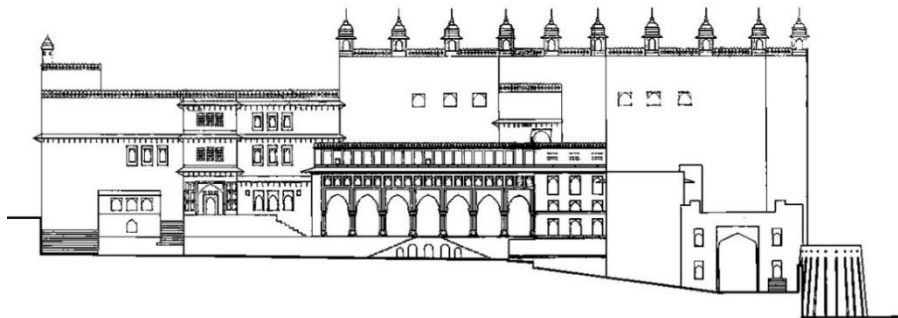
North Elevation of Ram Raja Mahal (CEPT Archives, n.d.)
